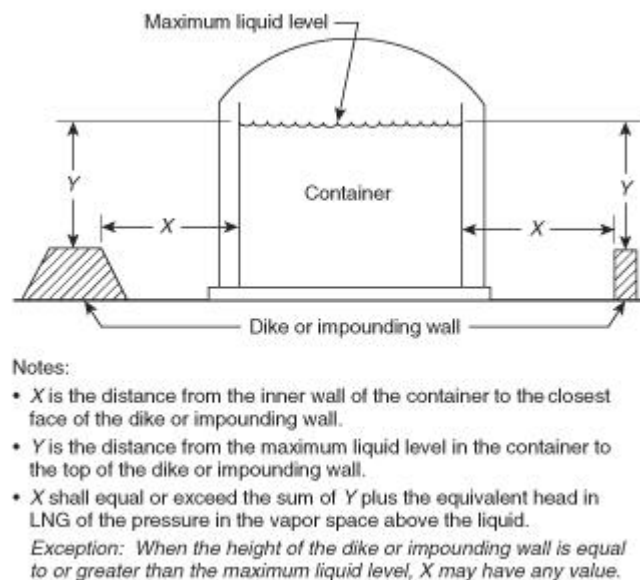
Dike or Impoundment Wall Proximity to Containers.
